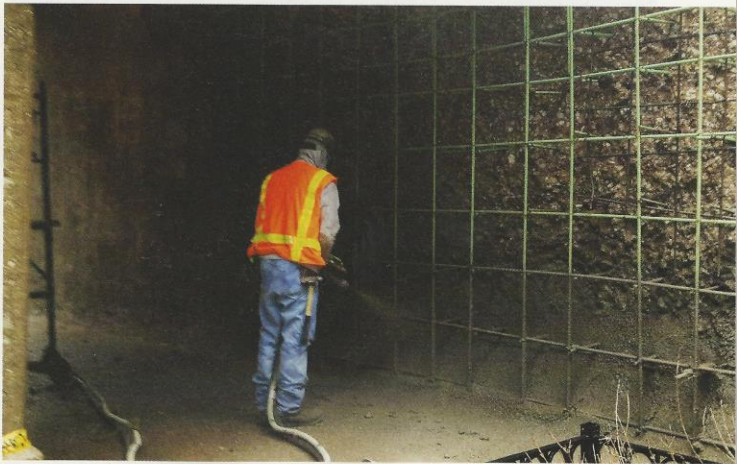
ACI Certified Nozzlemaster shotcreting newly-reinforced repair areas
